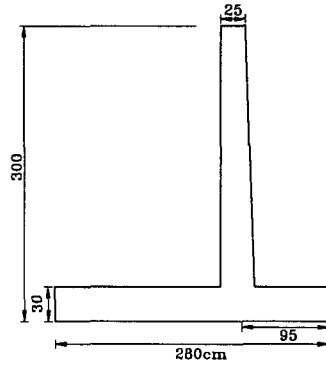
Retaining wall specimen for testing compactability and formwork pressure
